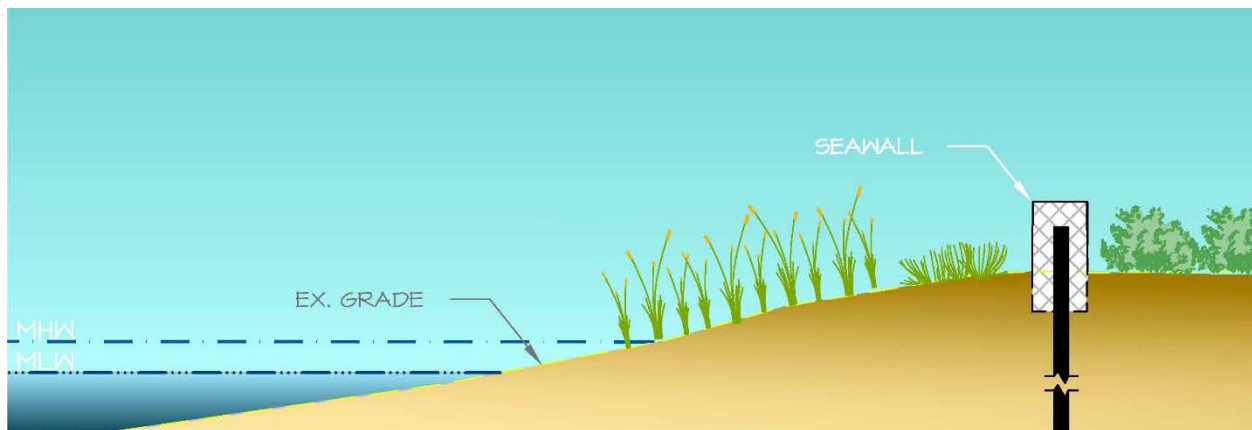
Sheet Wall with Concrete Cap and Marsh Vegetation
